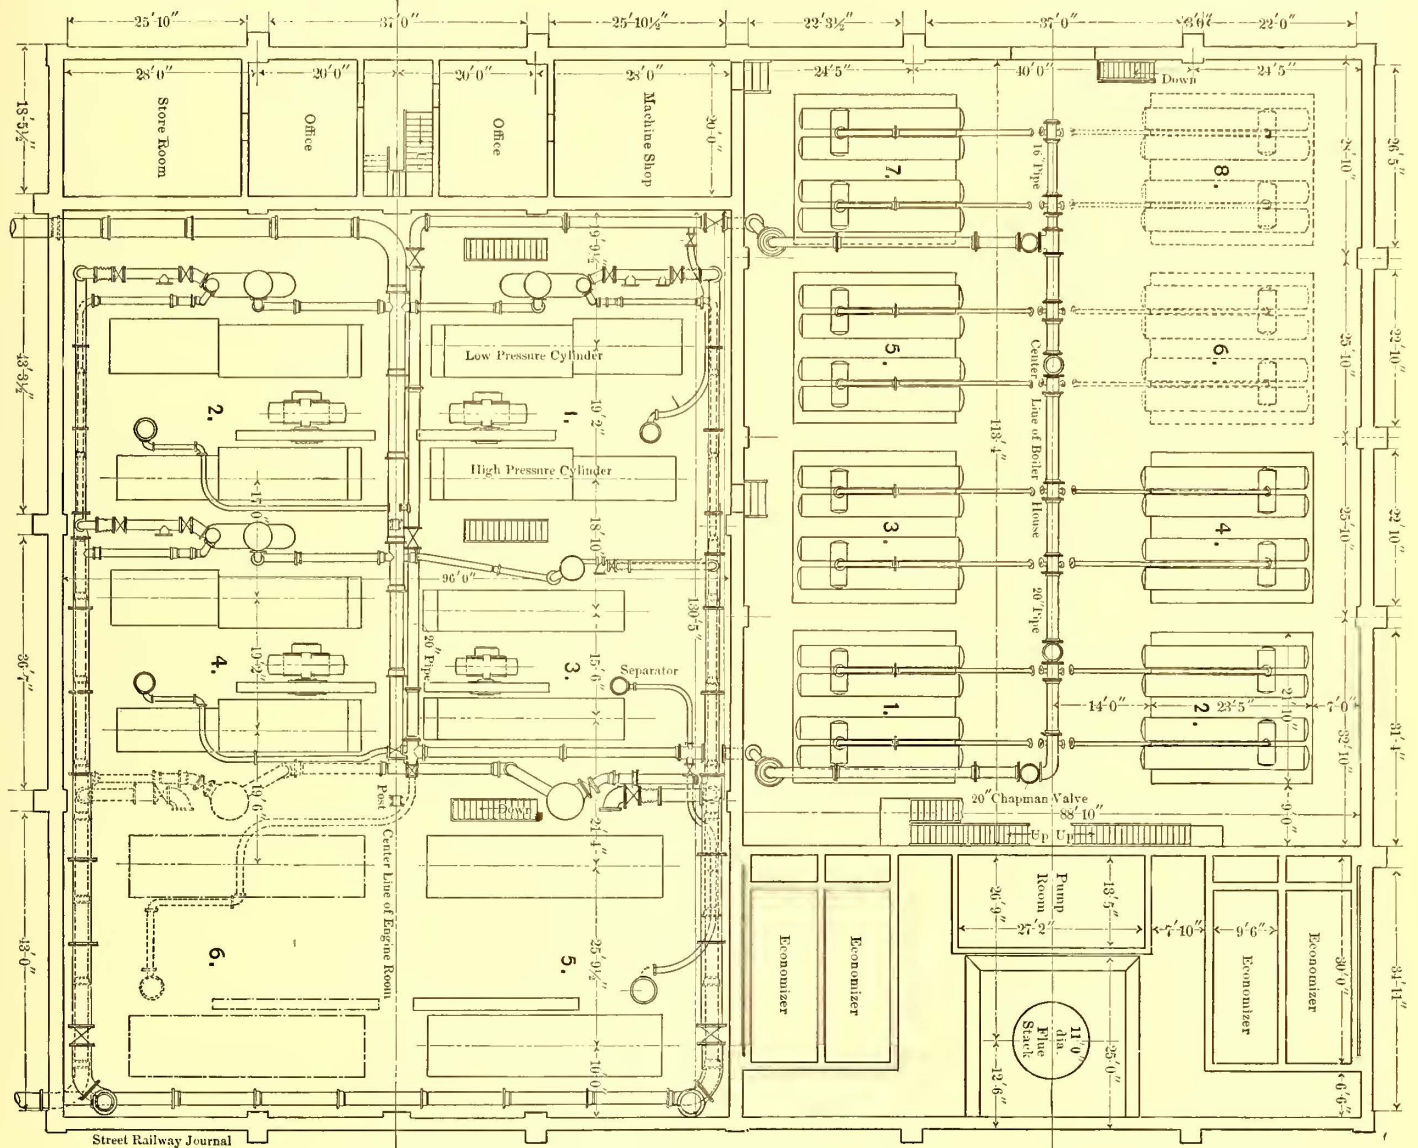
PLAN OF POWER STATION, SHOWING PIPING—NEWARK.
